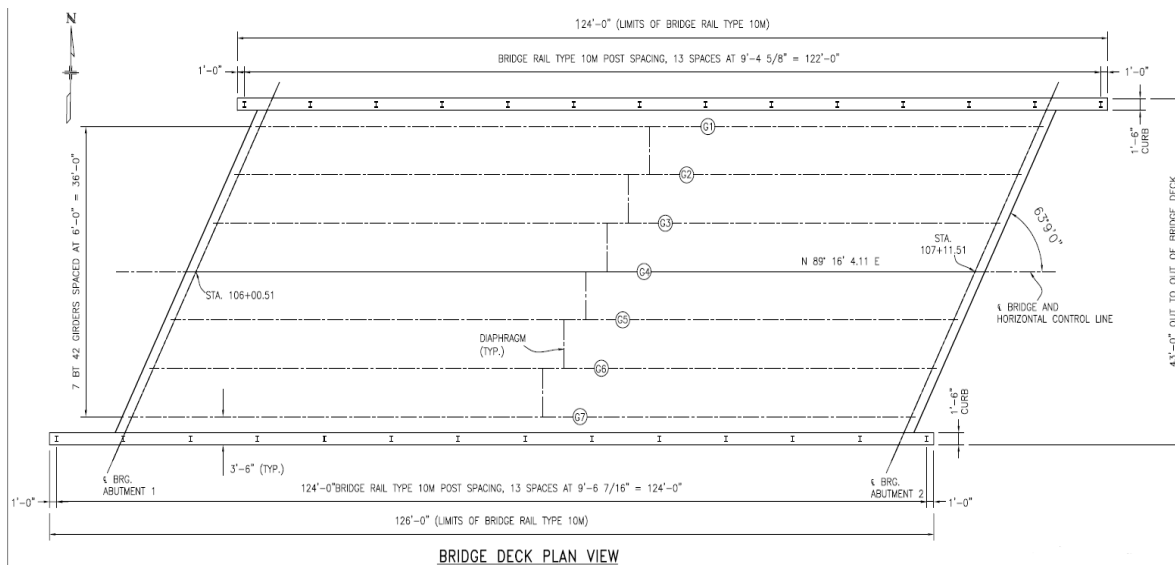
Plan view of C-15-AM (CDOT see Appendix A)
